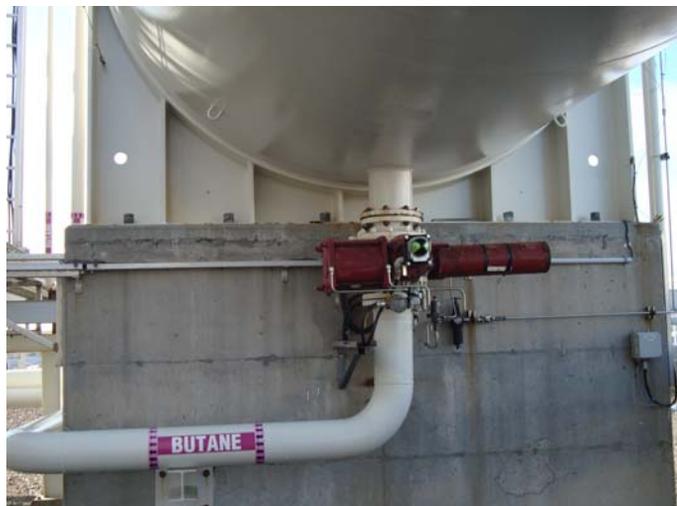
South vessel support North face, in good condition with light patches of coating breakdown along flange connection to concrete. Photo taken facing North
